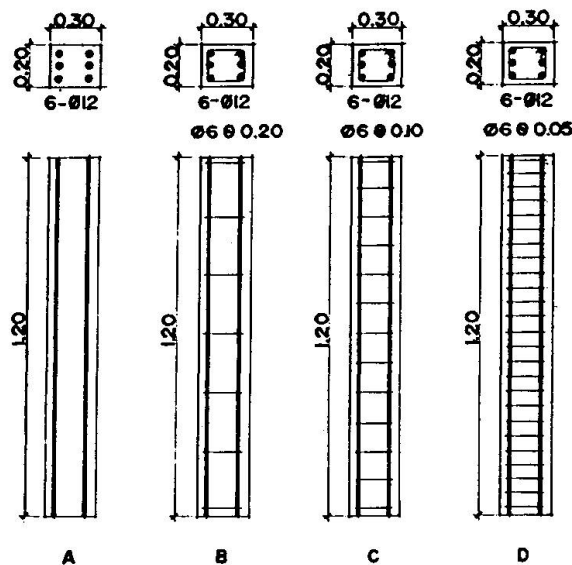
Detail of main and tie bars of reinforced concrete columns
